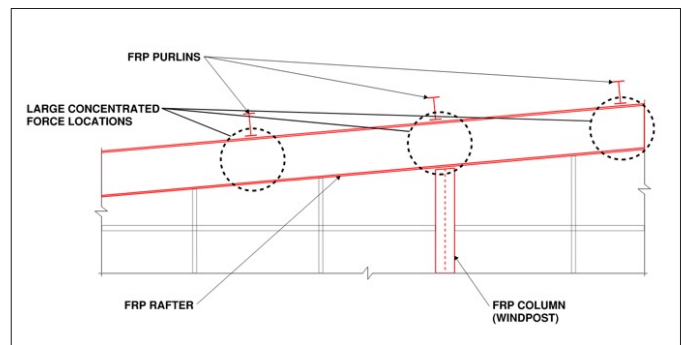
Concentrated Force from Purlins and Column acting on Rafter.
